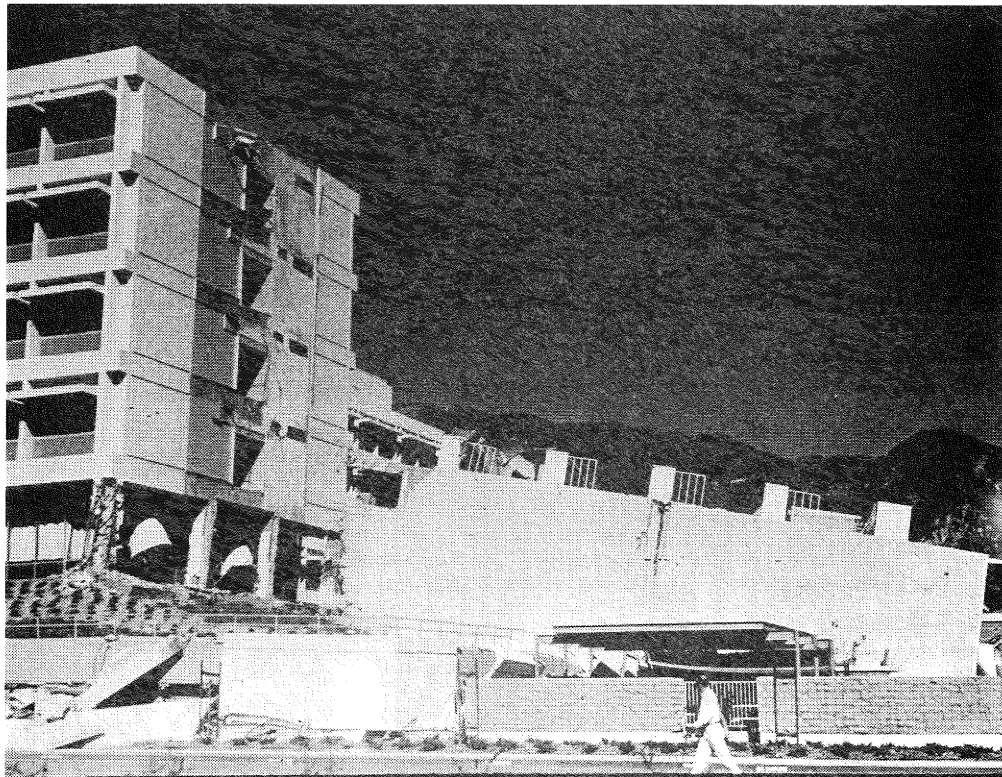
Overturned end tower of Olive View Medical Center, Sylmar. Note complete absence of ties between tower and main building and failed corner column of main building.
